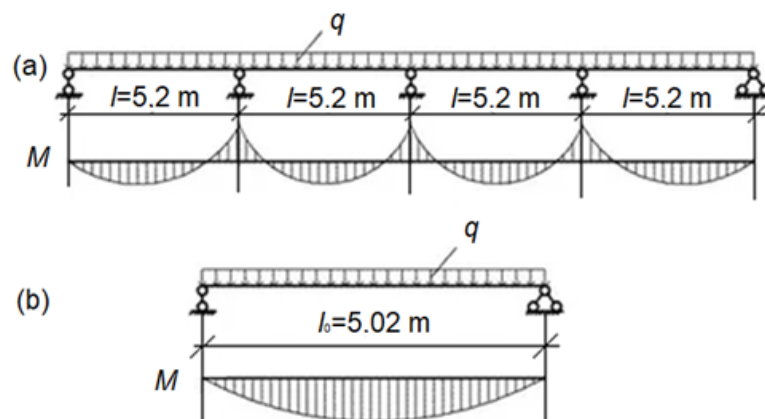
Calculation scheme of a reinforced concrete slab along a profiled deck:
